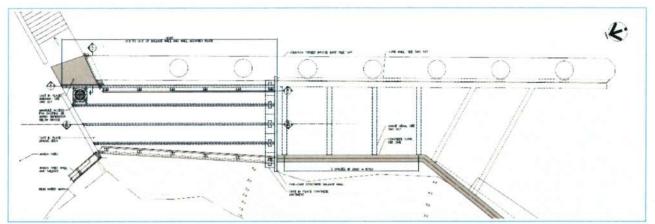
Plan view of bridge structure and at-grade concrete slab/brick pavers.
